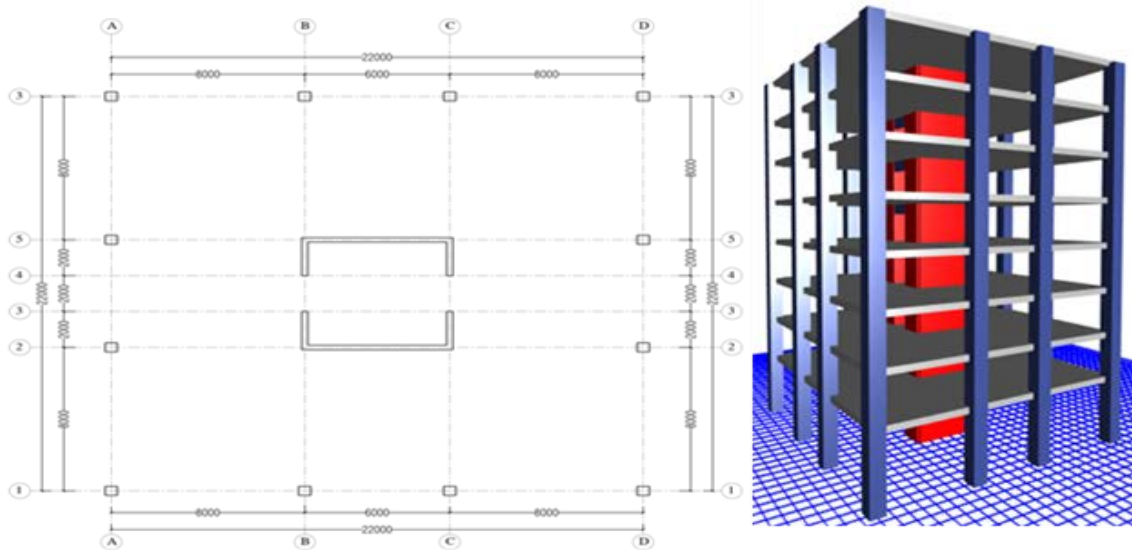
Floor Plan and 3D Finite Element Model of Structure (all dimensions in mm)
